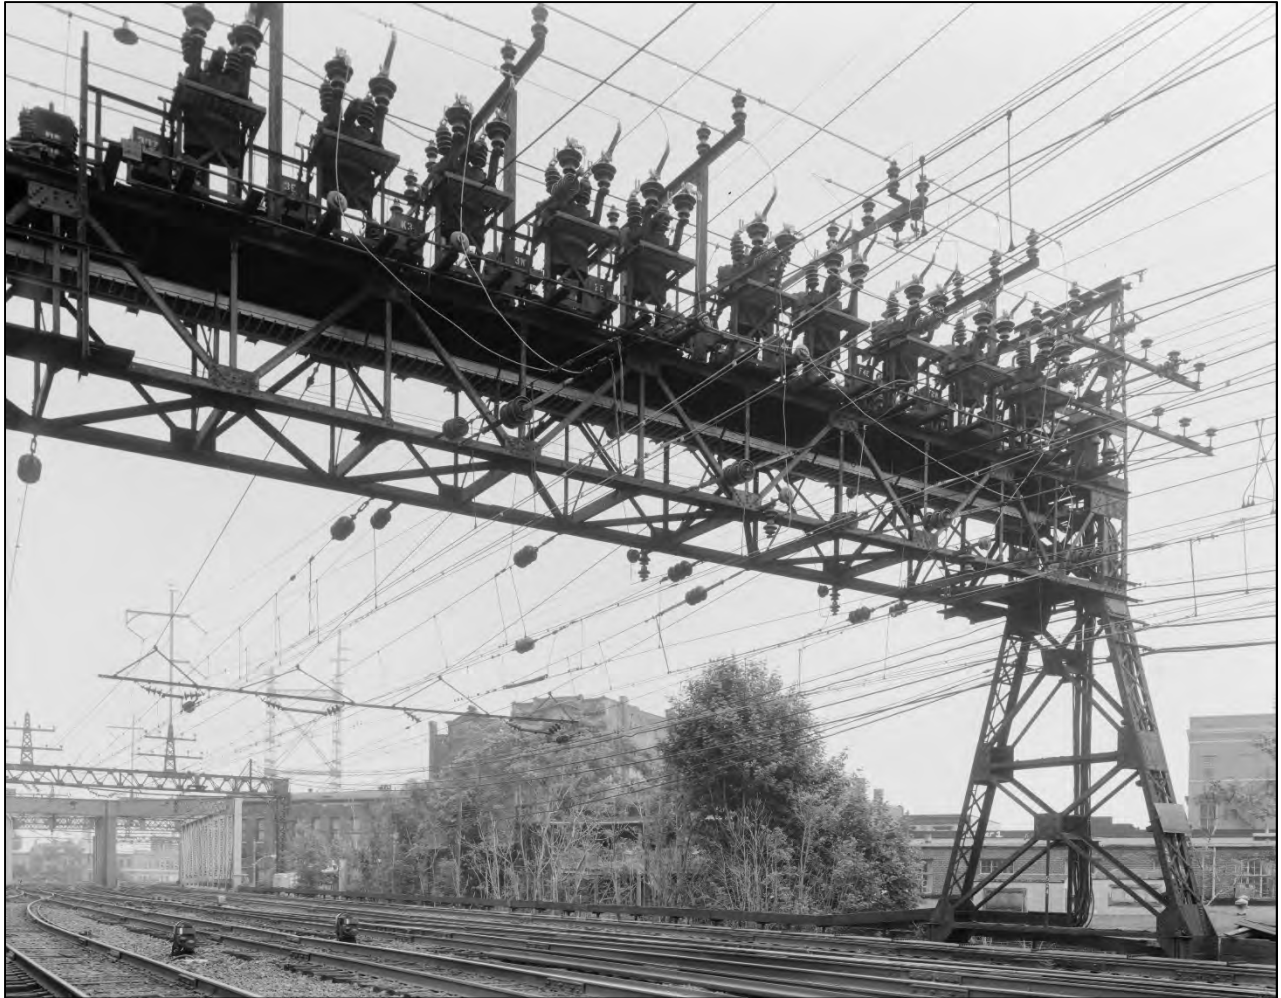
Anchor Bridge 524 (sectionalizing bridge) looking southeast, 1980, Historic American Engineering Record photograph by Thomas Brown, “New York, New Haven & Hartford Railroad, Automatic Signalization System (HAER No. CT-8).
